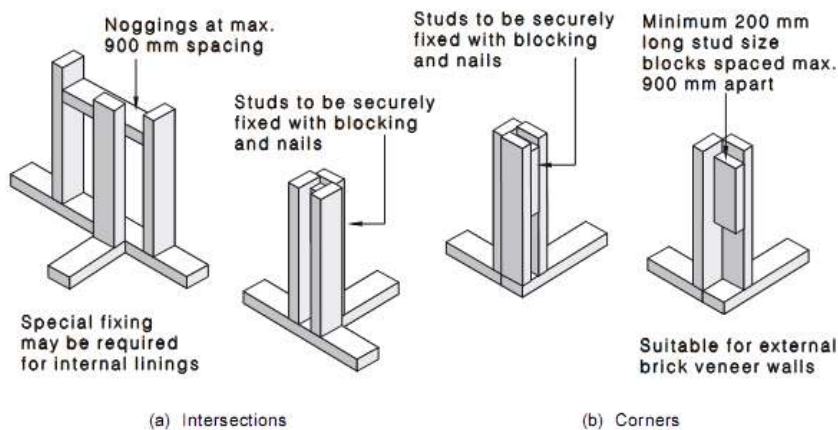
TYPICAL WALL JUNCTIONS
